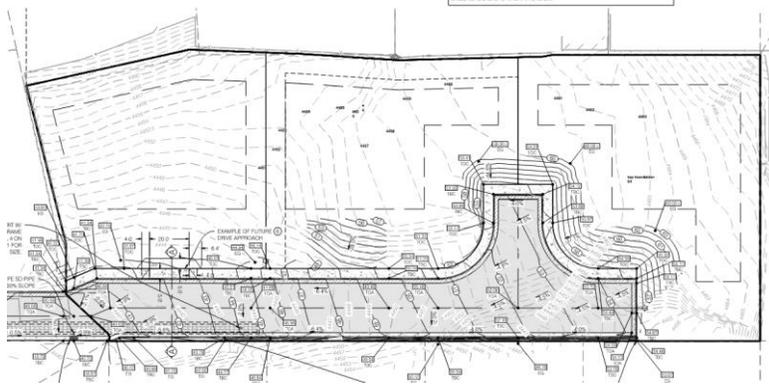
Snippet of Honeycut Hollow Subdivision Approved Grading and Drainage Plan
